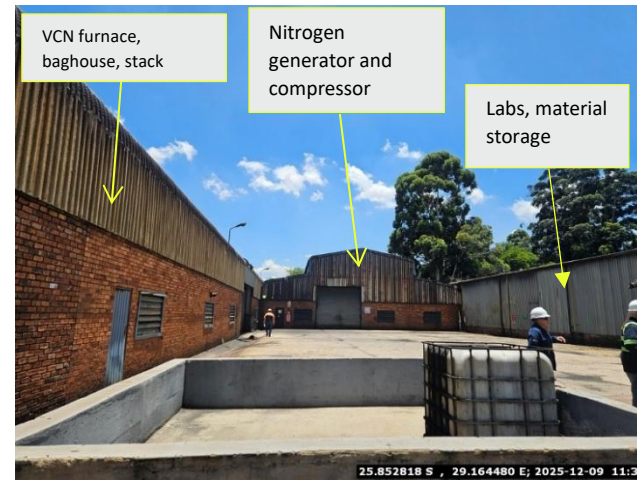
Northward view of the existing structure onto which the VCN furnace will be installed (Furnace to be installed on the west wing with stack and baghouse, Nitrogen generator and compressor in the north wing of the building, and Labs on east wing)
